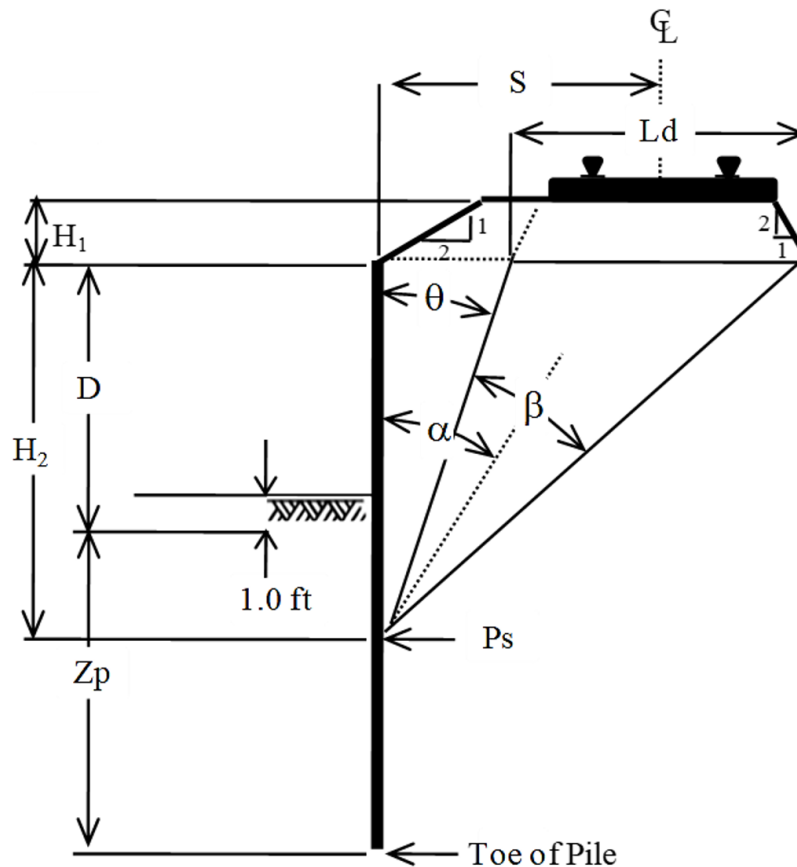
, Railroad Adjacent to Soldier Pile Wall
